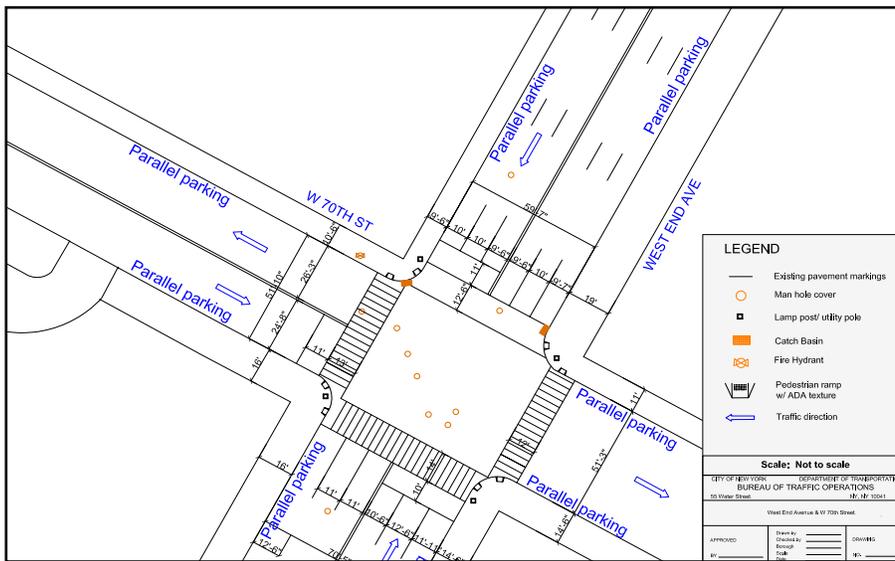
Existing Condition - West End Ave & West 70th Street
